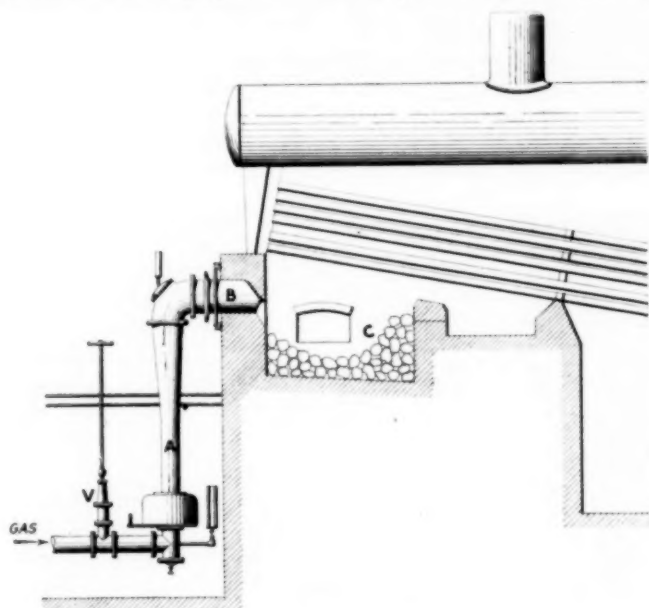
LONGITUDINAL SECTION OF BOILER WITH GAS BURNER
